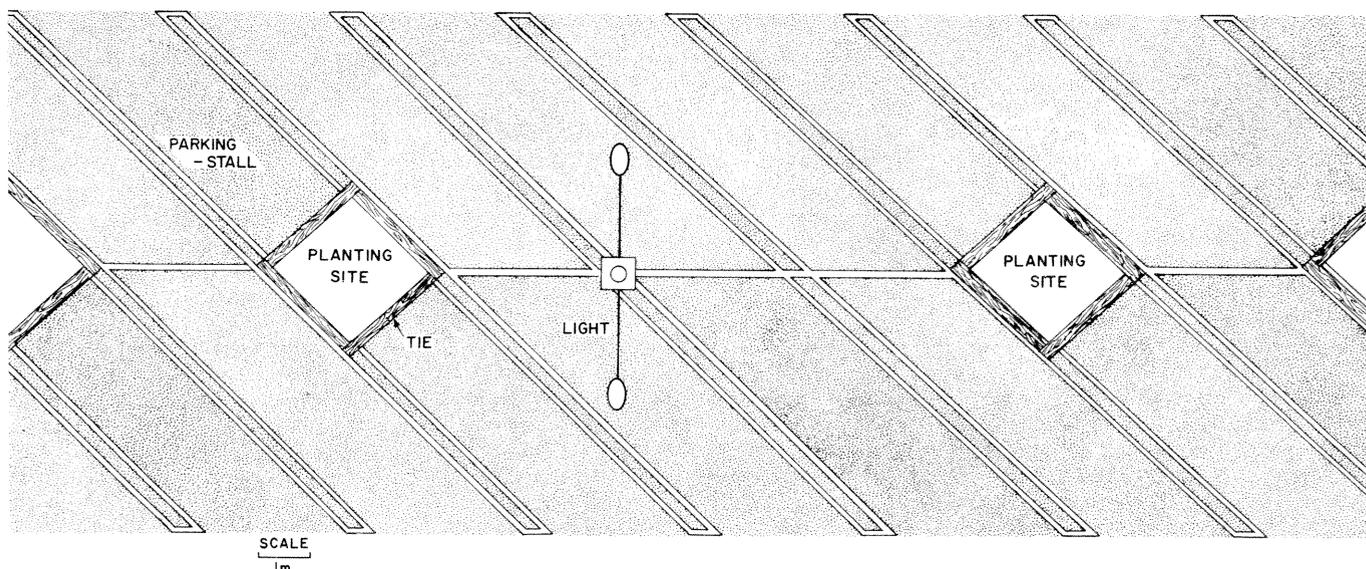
Diamond planter pattern used within the diagonal parking stalls.
